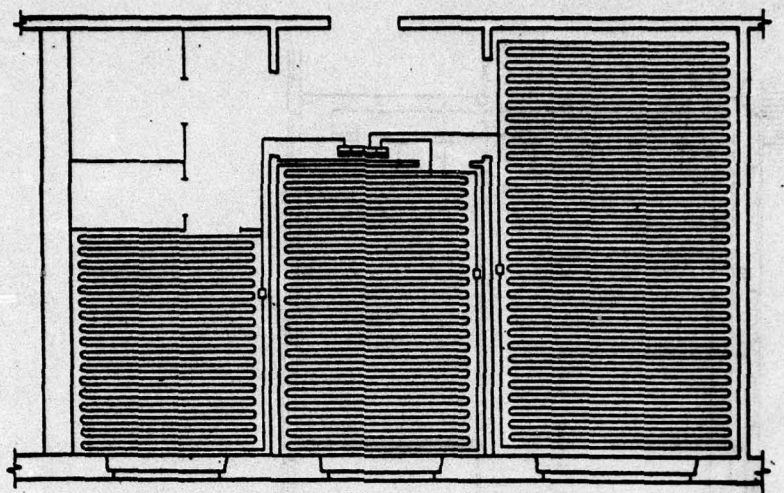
Heating a Floor with Electric Cable (diagram of cable layout)
